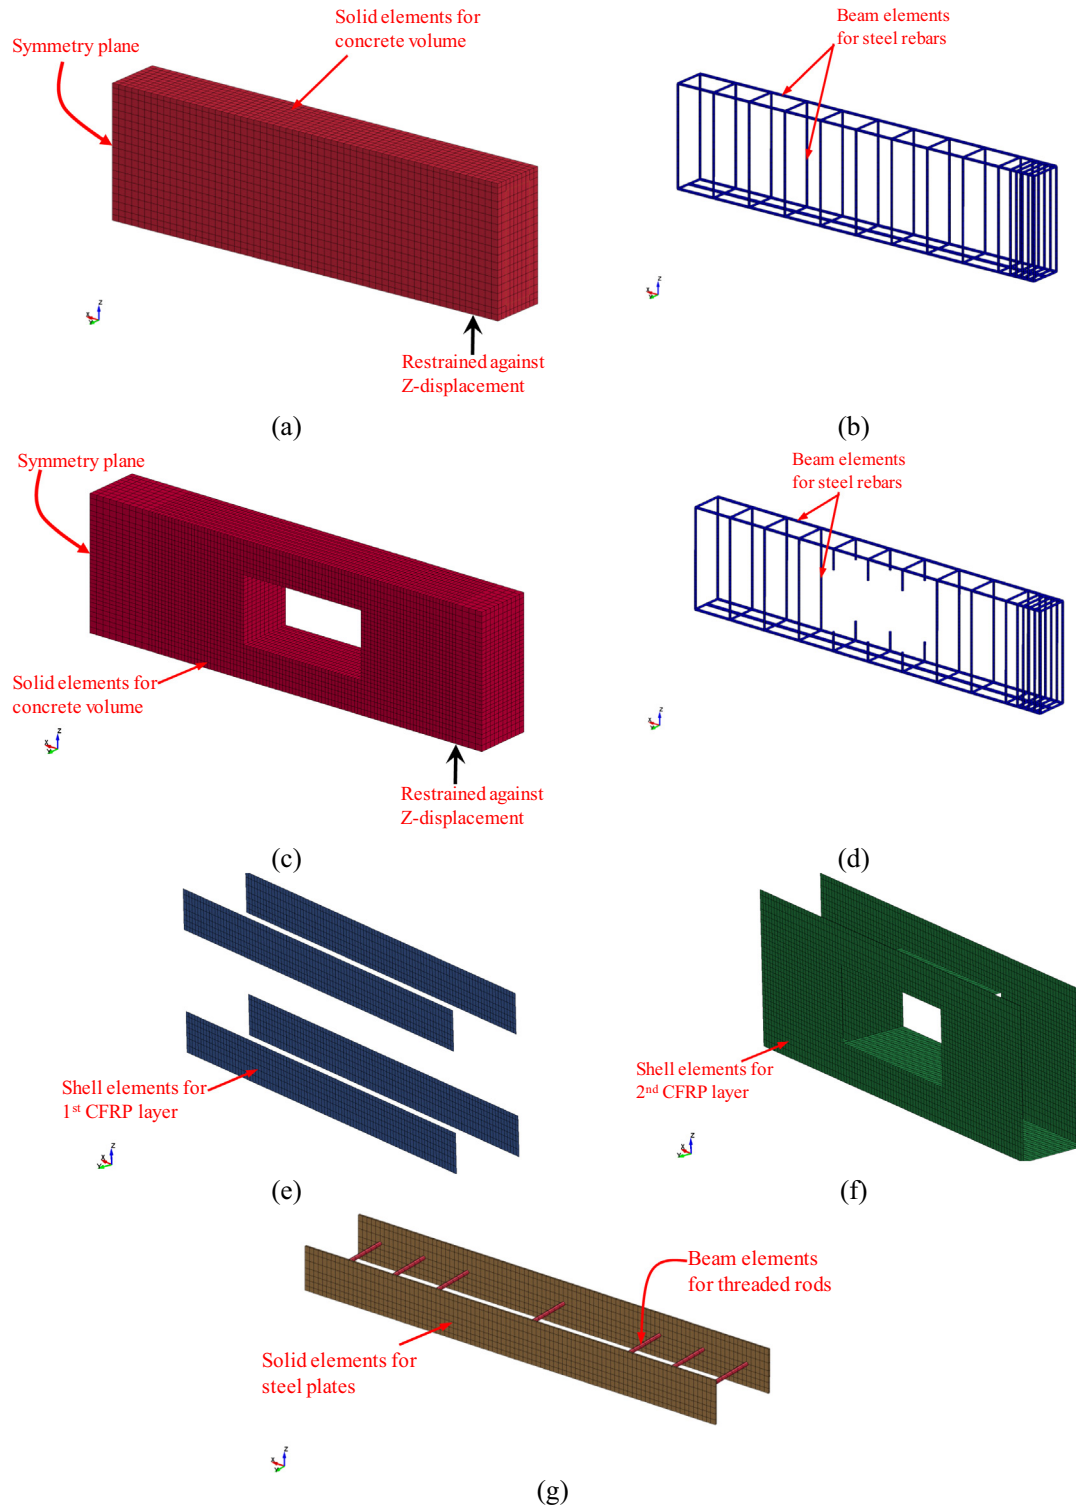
FE model for one-half of specimens: (a) Concrete volume for beam BC-N; (b) Steel rebars for beam BC-N; (c) Concrete volume for beam BC-O1; (d) Steel rebars for beam BC-O1; (e) 1st CFRP layer for beam BS1-O1; (f) 2nd CFRP layer for beam BS1-O1; (g) Steel plates with rods for beam BS2-O1.
